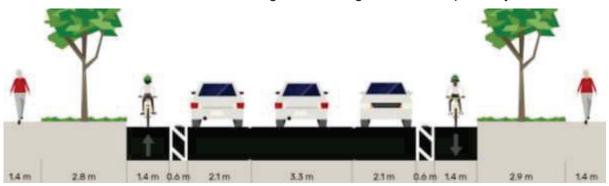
Previously Endorsed Cross Section – Moreland Road to The Grove
